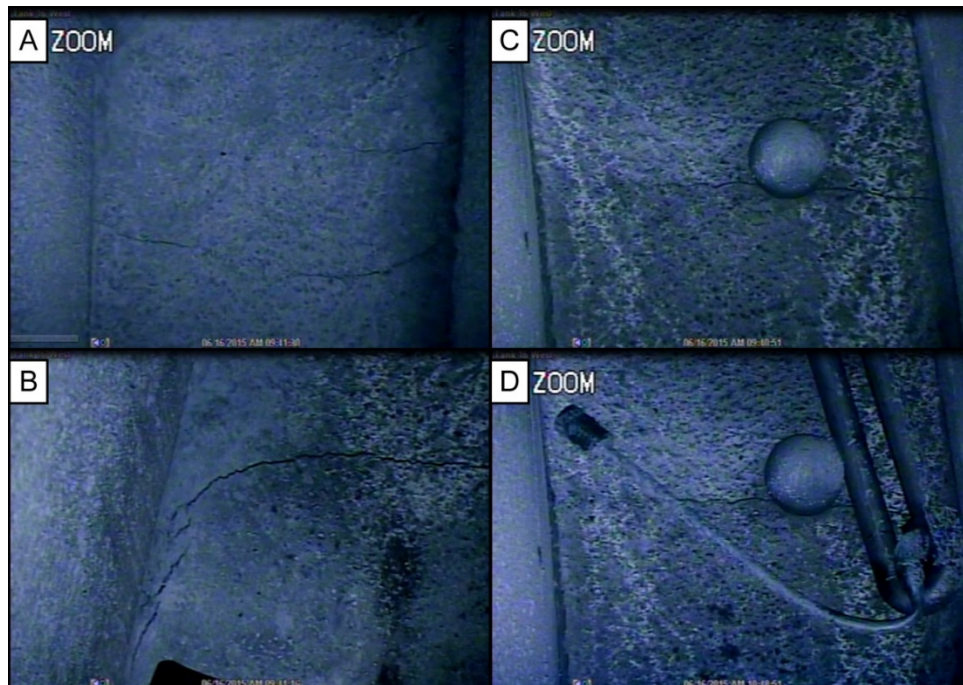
Cracks Formed in Tank Grout in the Tank 16H Annulus Beneath the West Riser. A. Cracks Formed North of the Discarded Tremie. B. *En Echelon* Cracks Formed South of the Discarded Tremie. C. Crack Formed Beneath Discarded Pig Further South of the Discarded Tremie. D. Jet Dropped Above Crack at Pig. Date of Video: June 16, 2016.
